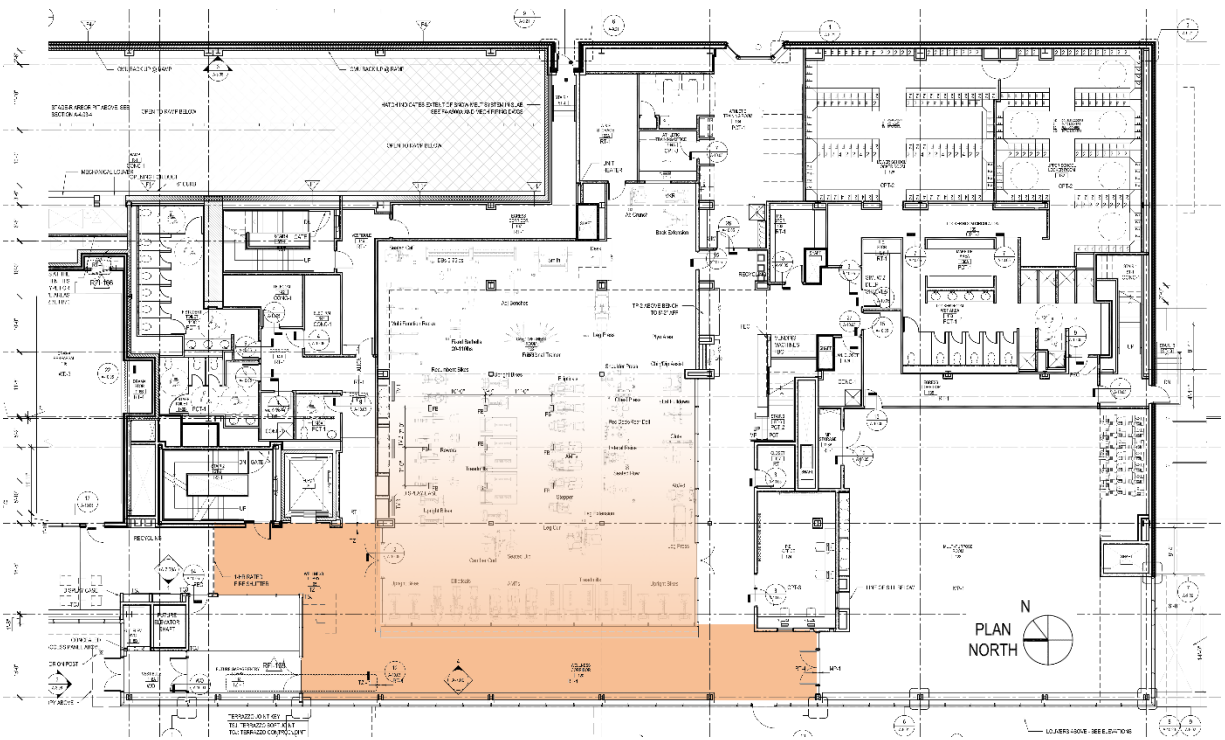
First Floor South Plan - Wellness Lobby and Possible Fitness Area
